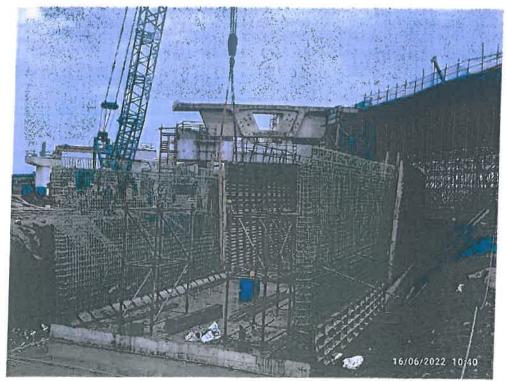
Retaining wall formwork fixing at Ramp CA in progress
